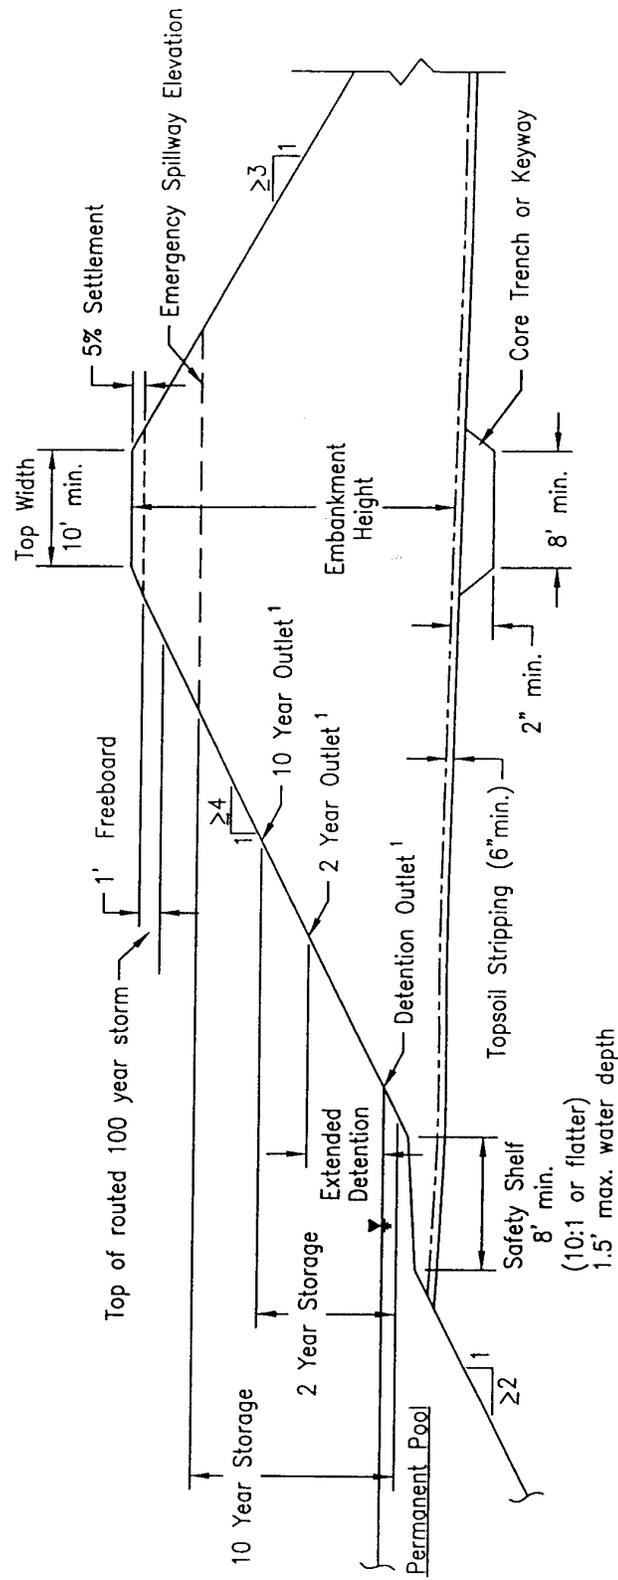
Typical Embankment Cross Section for Wet Detention Basin
